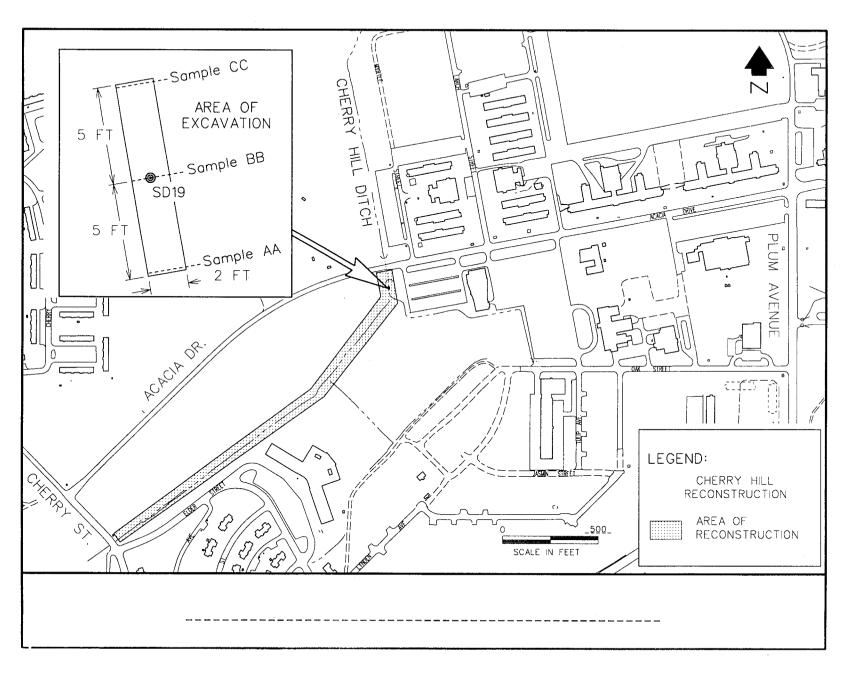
Location of Excavation and Reconstruction at Cherry Hill Ditch, Elmendorf AFB, AK
